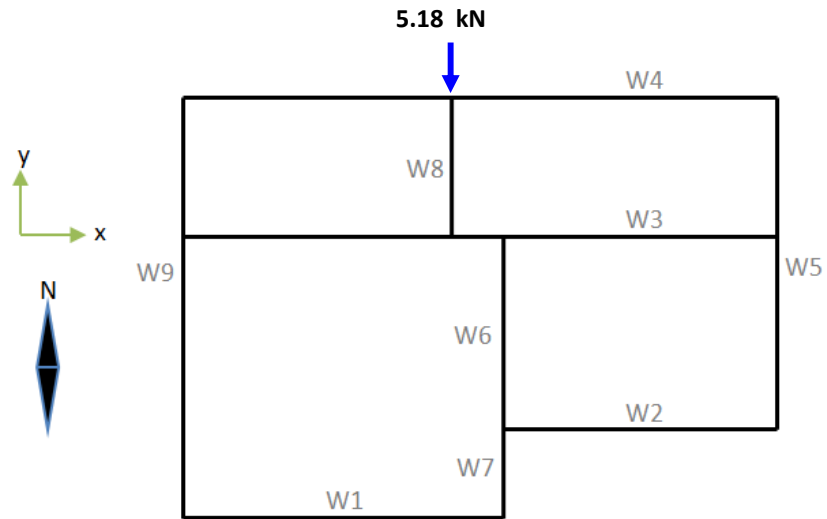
Load Case 6 – 5.18 kN Applied to Top-Plate at Wall 8
